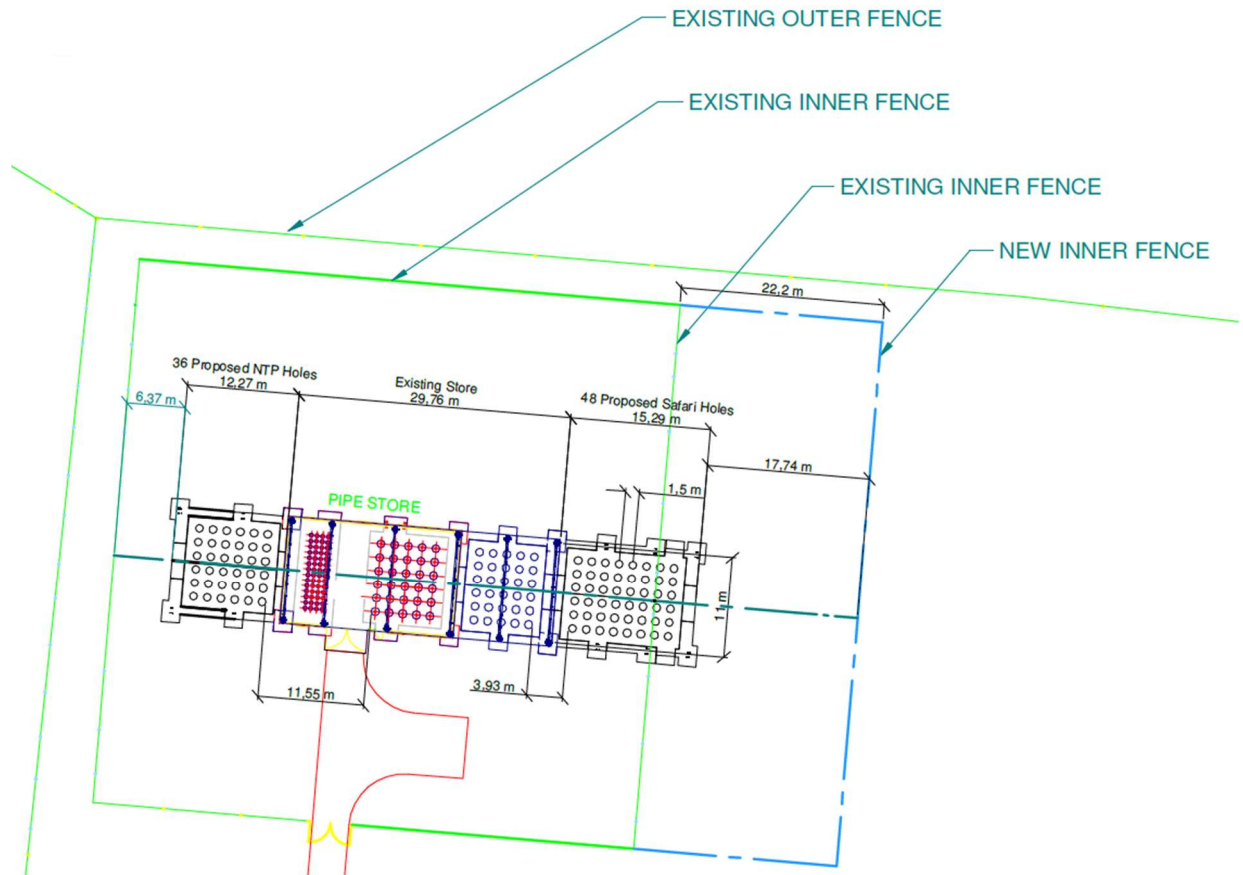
Area layout, showing the extended TPS facility, and the existing and new security perimeter
